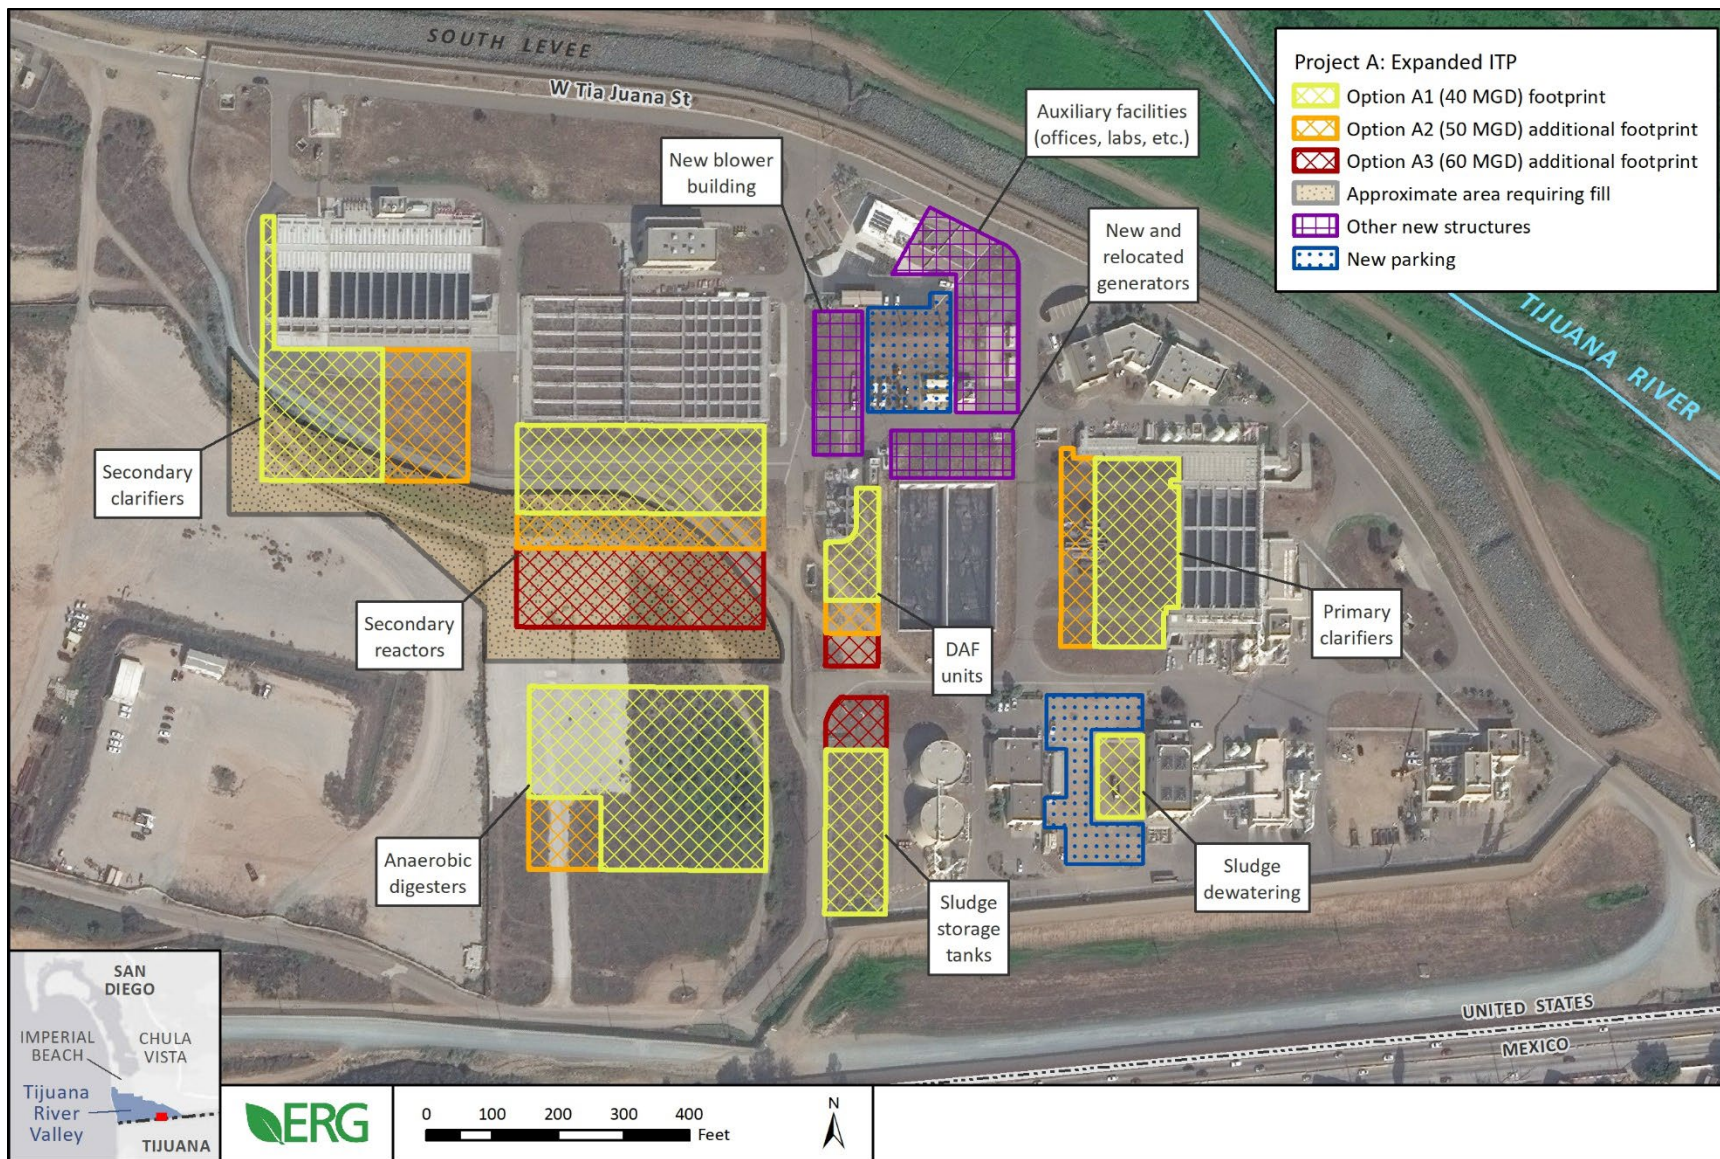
Project A (Expanded ITP) – Conceptual Site Plan of Proposed Facilities
